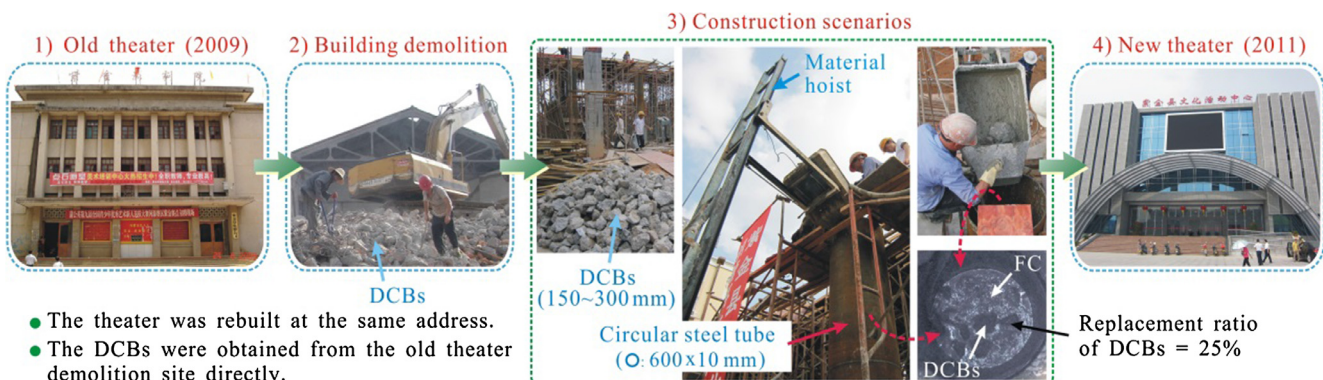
Application of columns filled with RBC in a theater building in Guangdong, China.
